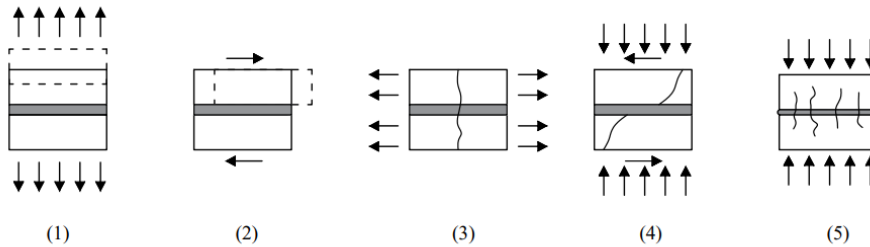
Masonry failure mechanisms: (1) joint debonding, (2) sliding along joints, (3) unit direct tension cracking, (4) shear-compression cracking of unit and (5) crushing
